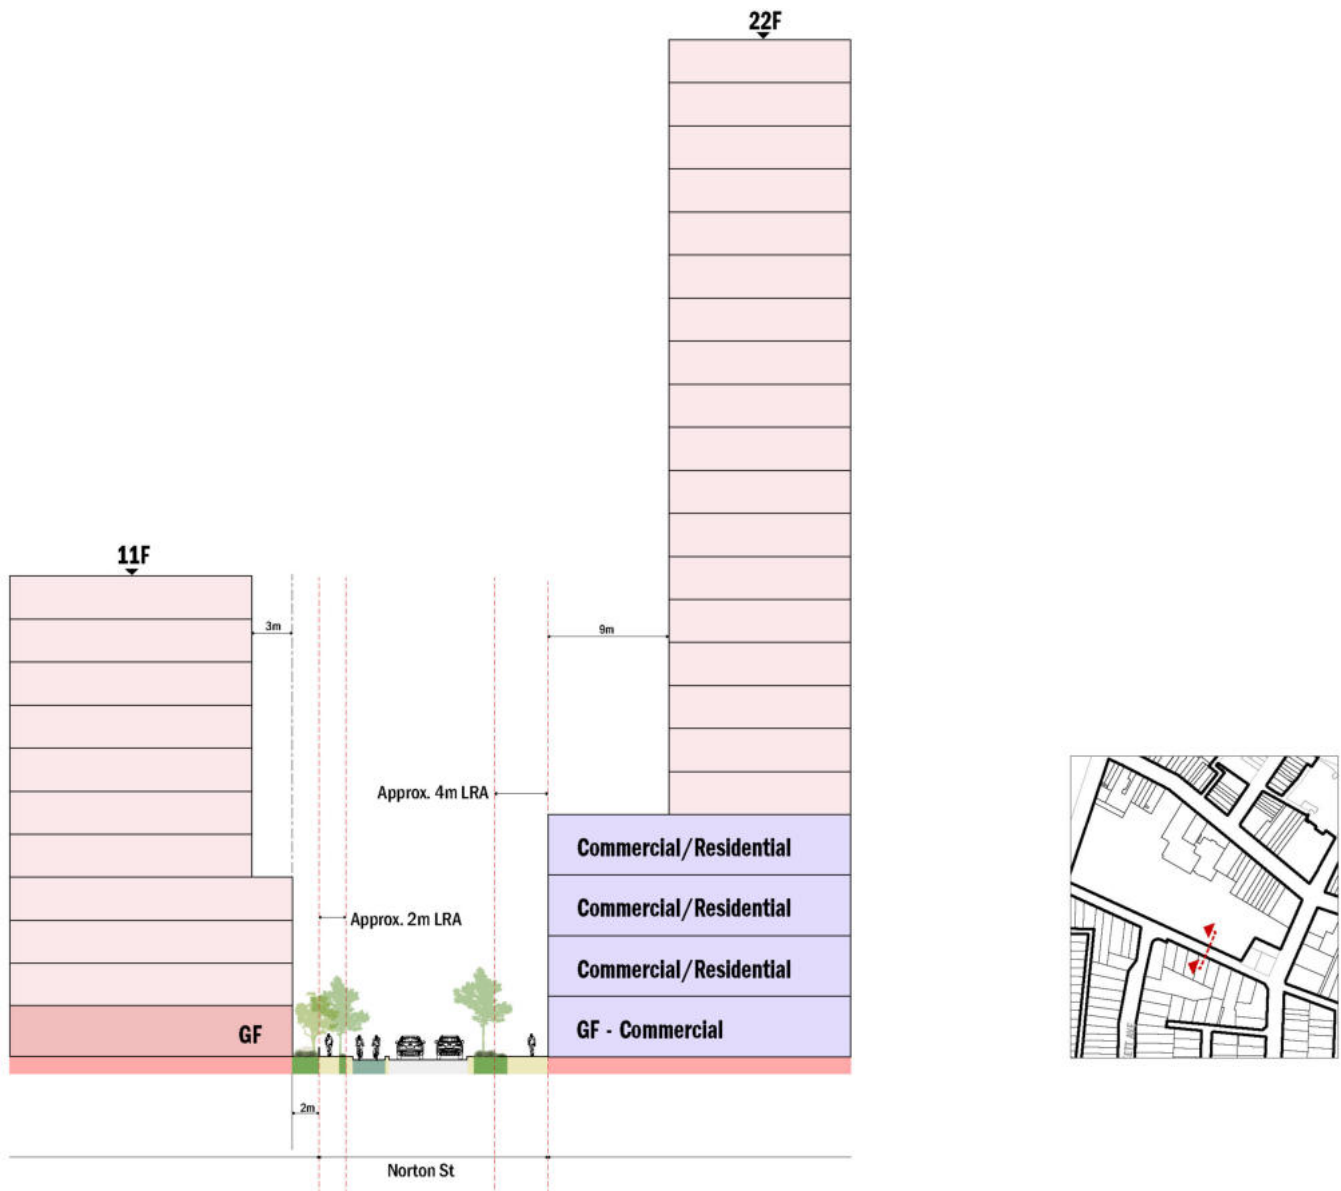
Ashfield CBD – Norton Street Section – 22 Storey (Knox to Holden Street)
